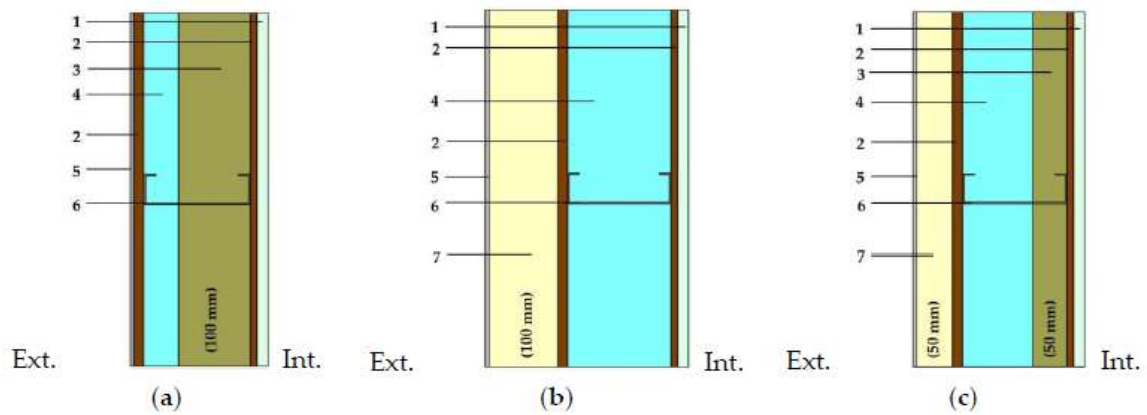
Facade wall assemblies, (a) Warm, (b) Cold, and (c) hybrid frame construction. Materials: 1—Gypsum board; 2—OSB; 3—RW; 4—Air; 5—ETICS finish; 6—LSF; 7—EPS (Roque and Santos, 2017).
